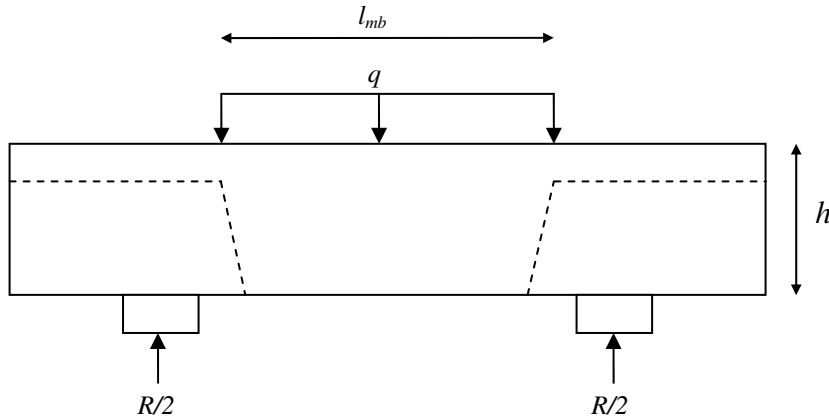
Load and boundary conditions commonly used in the design of transversal support beams.
